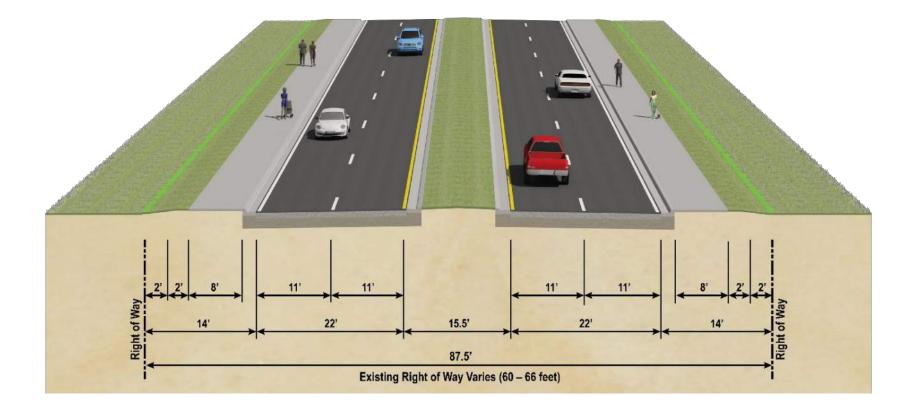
Minimized Four-Lane Divided Typical with 8 Foot Sidewalks
